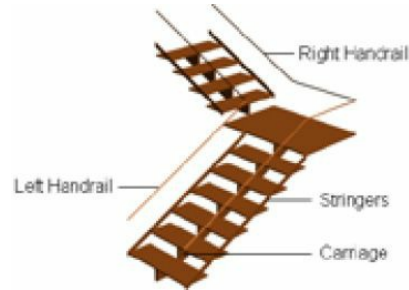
The L-Type stairs with handrails, carriage, and stringers
